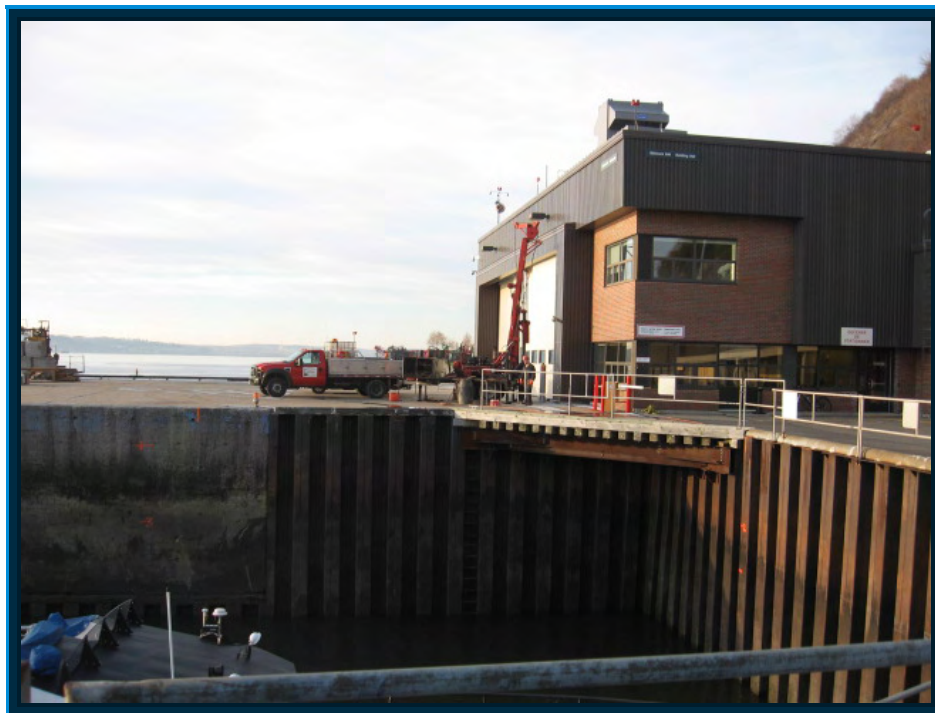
View of TF-12-09 drilling inside heliport building.
